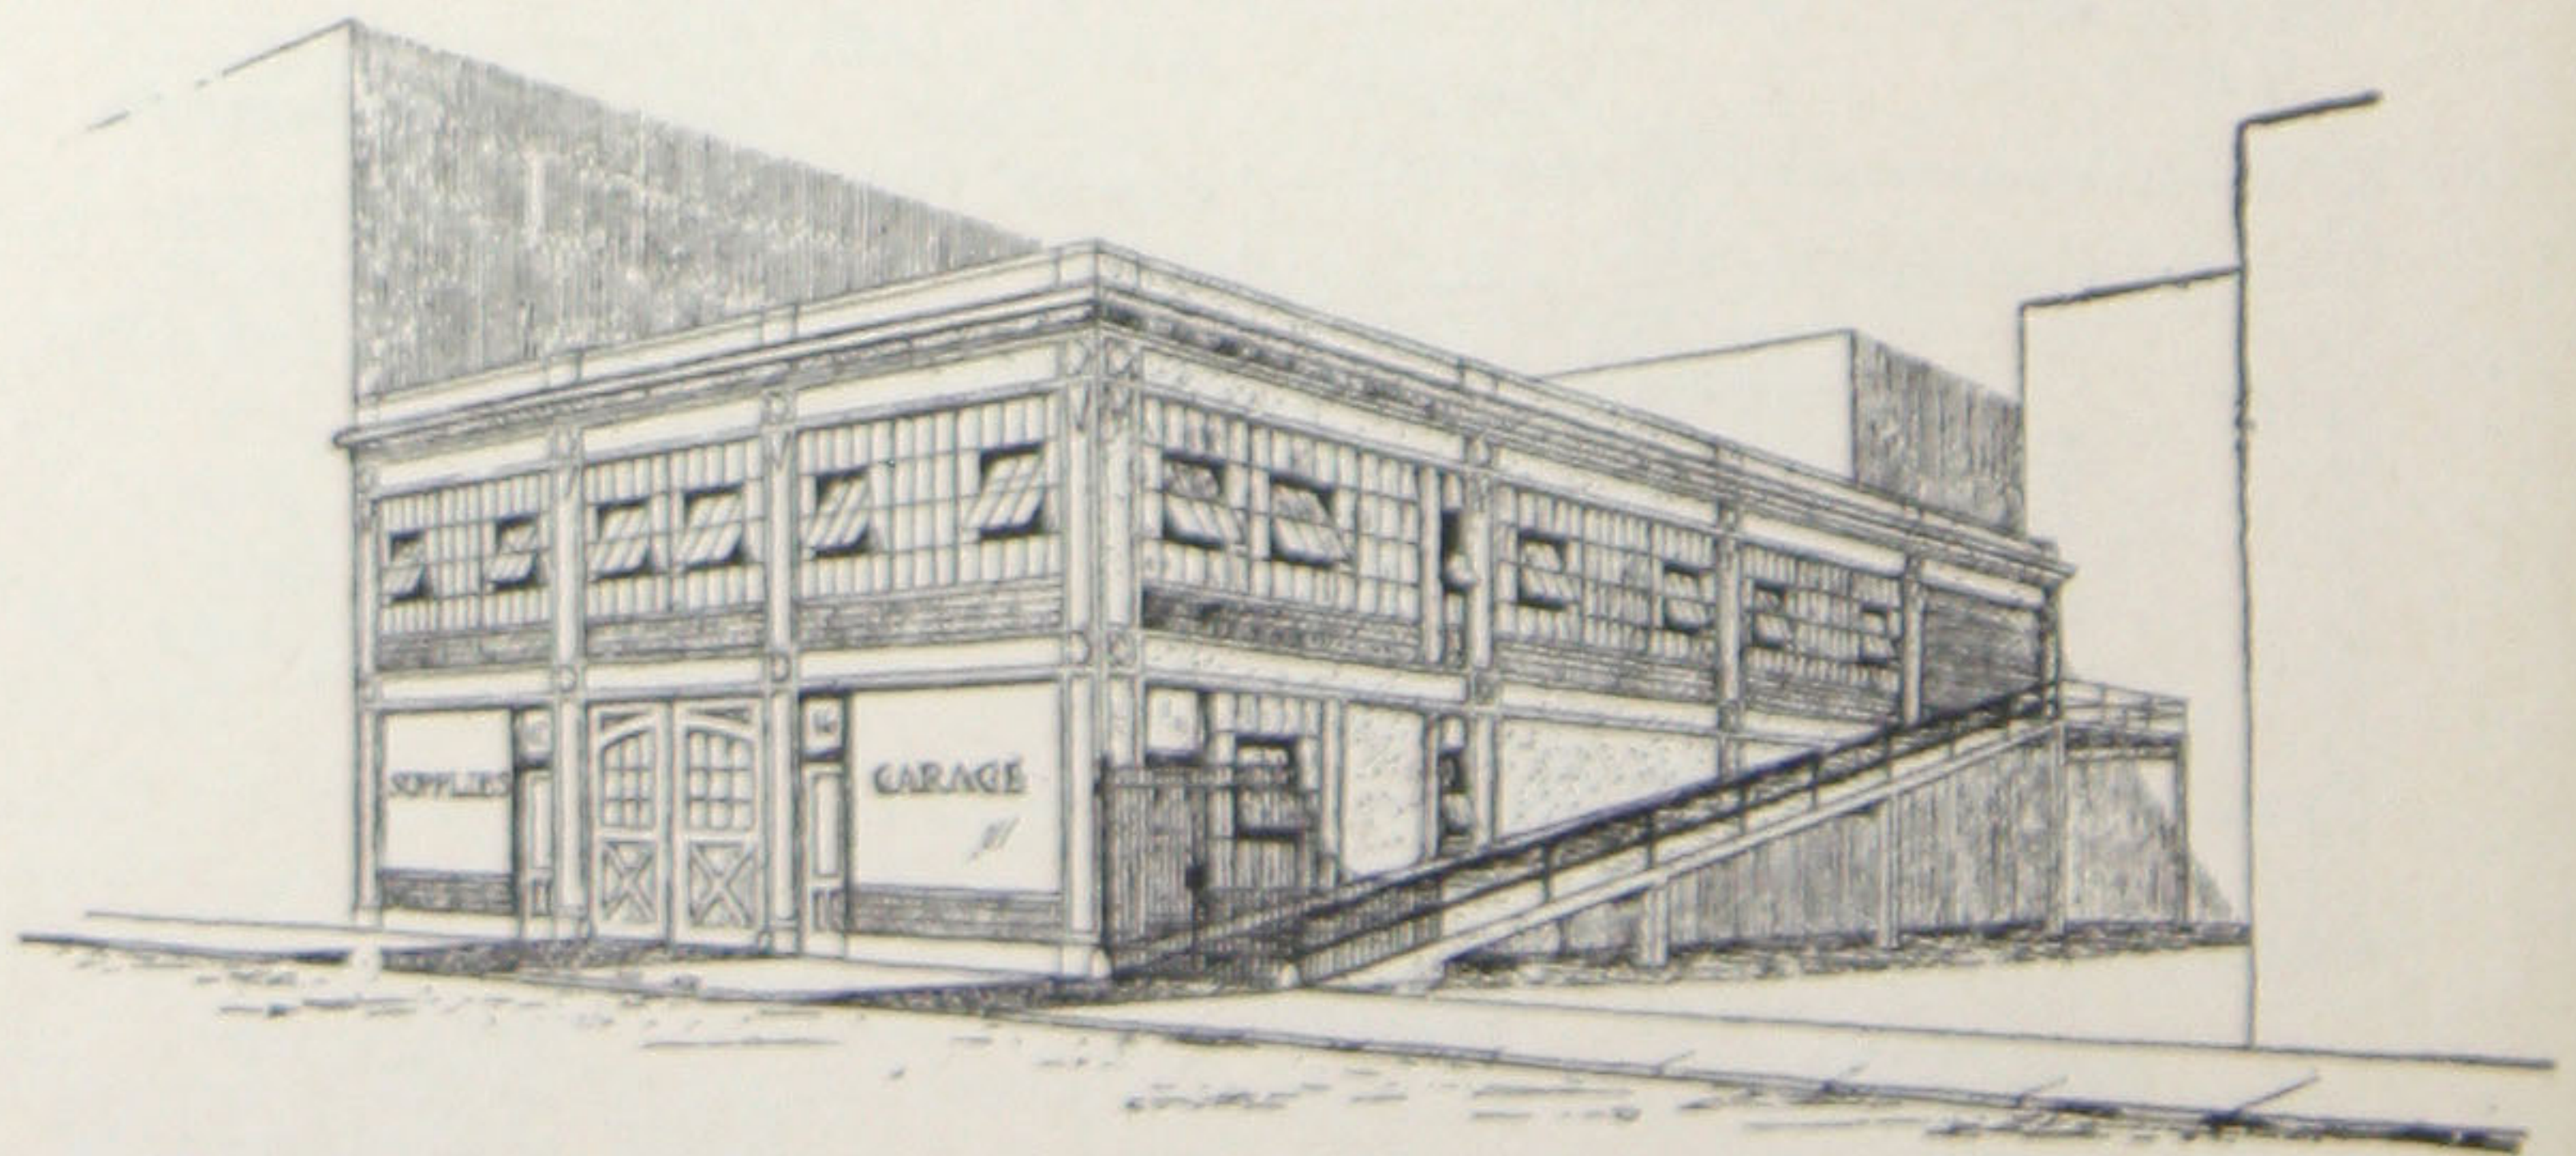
Two-story commercial garage with inclined runway to second floor.
